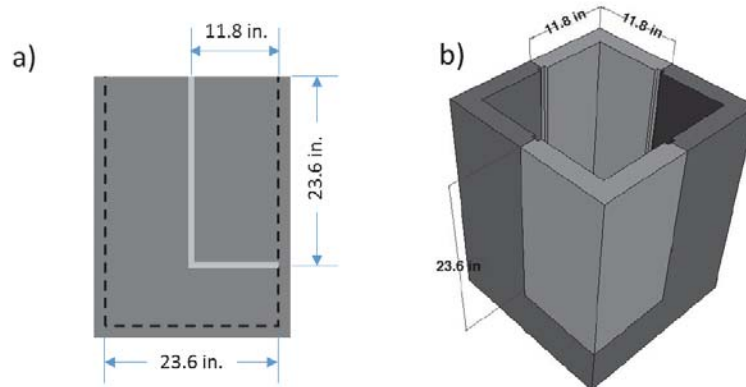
a) The front view of the horizontal and vertical construction joints in a sidewall and b) the 3d plot of the horizontal and vertical construction joints.
